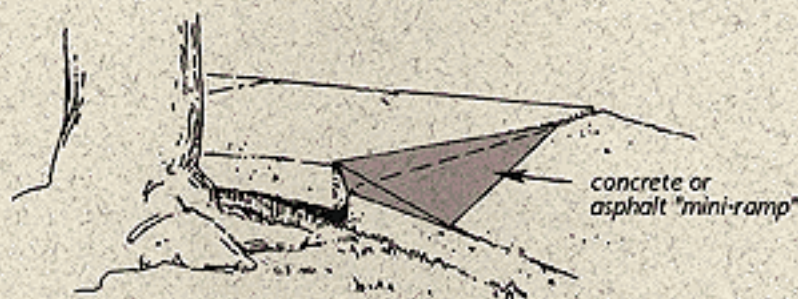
A "mini-ramp" can be used to smooth the uneven surface caused by root damage to pavement.
